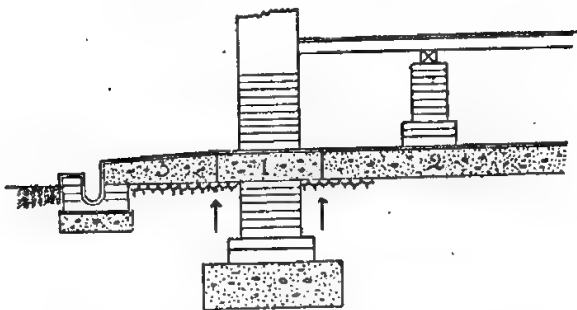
Detail of termite-proof construction: a layer of cement at ground level laid in three parts.
